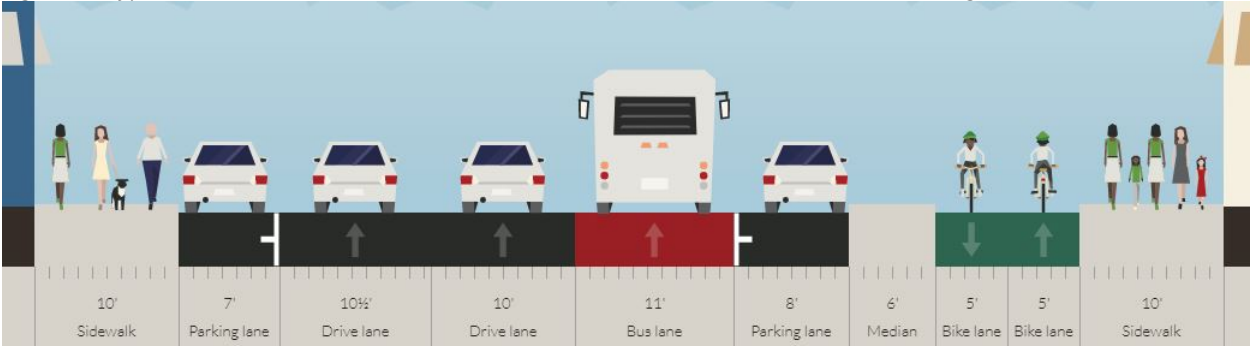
Typical Cross Section of Folsom Street between 5th Street and between 5th and 4th streets
